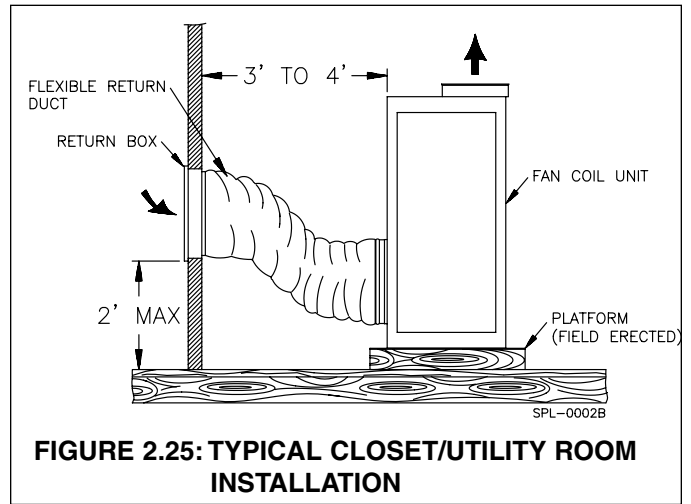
TYPICAL CLOSET/UTILITY ROOM INSTALLATION
